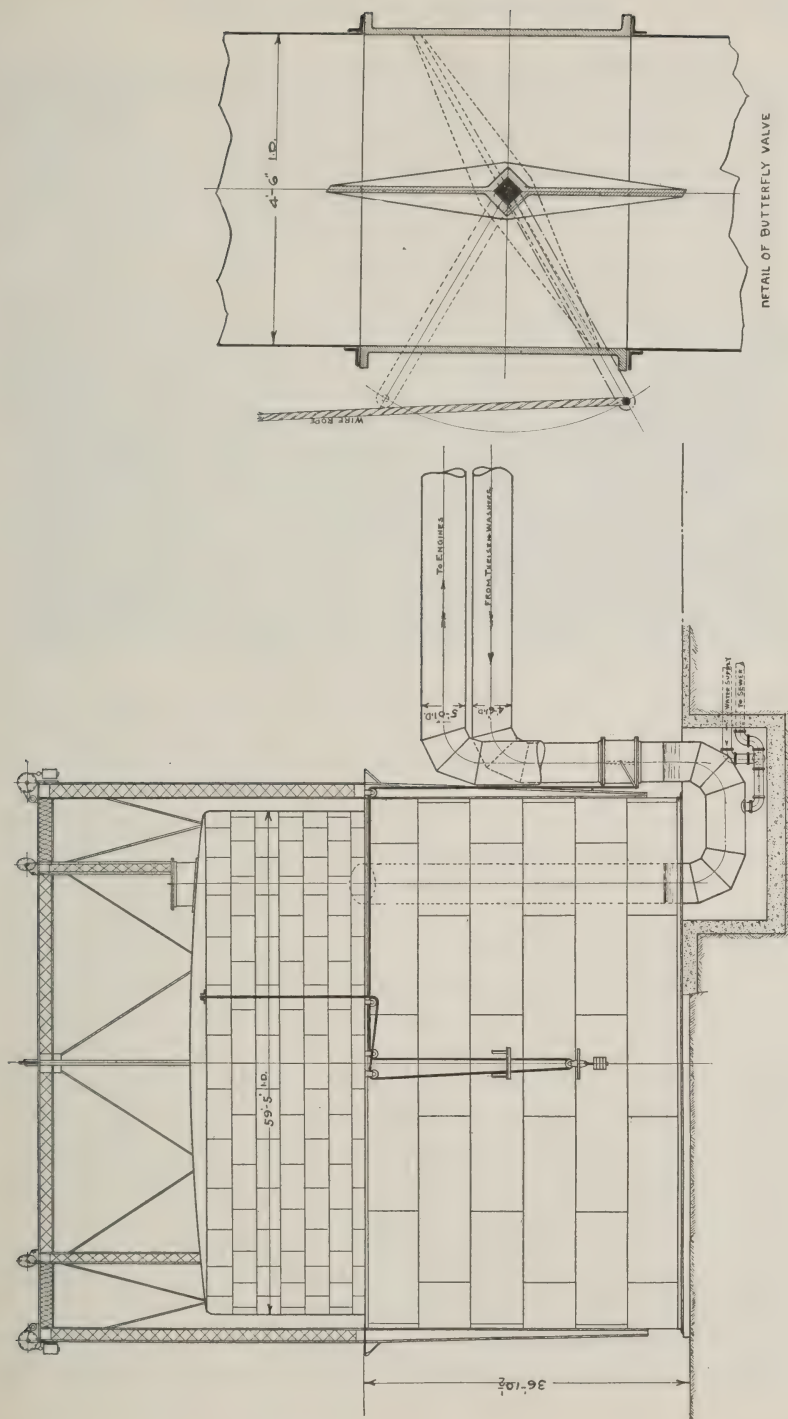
GAS HOLDER AND AUTOMATIC BUTTERFLY VALVE
